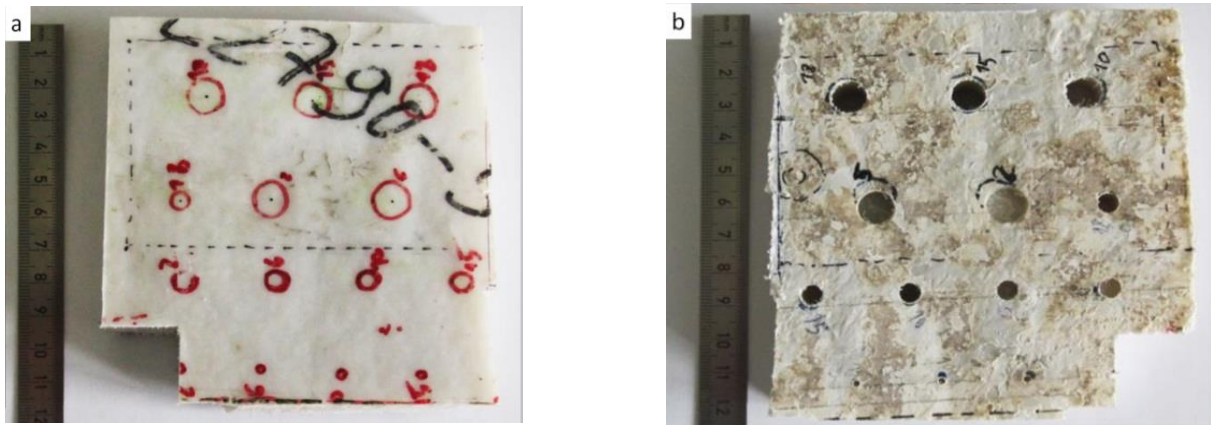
Flat bottom holes machined on the back-side of a CIPP sample, a) front-side of the CIPP, b) back-side of the CIPP
